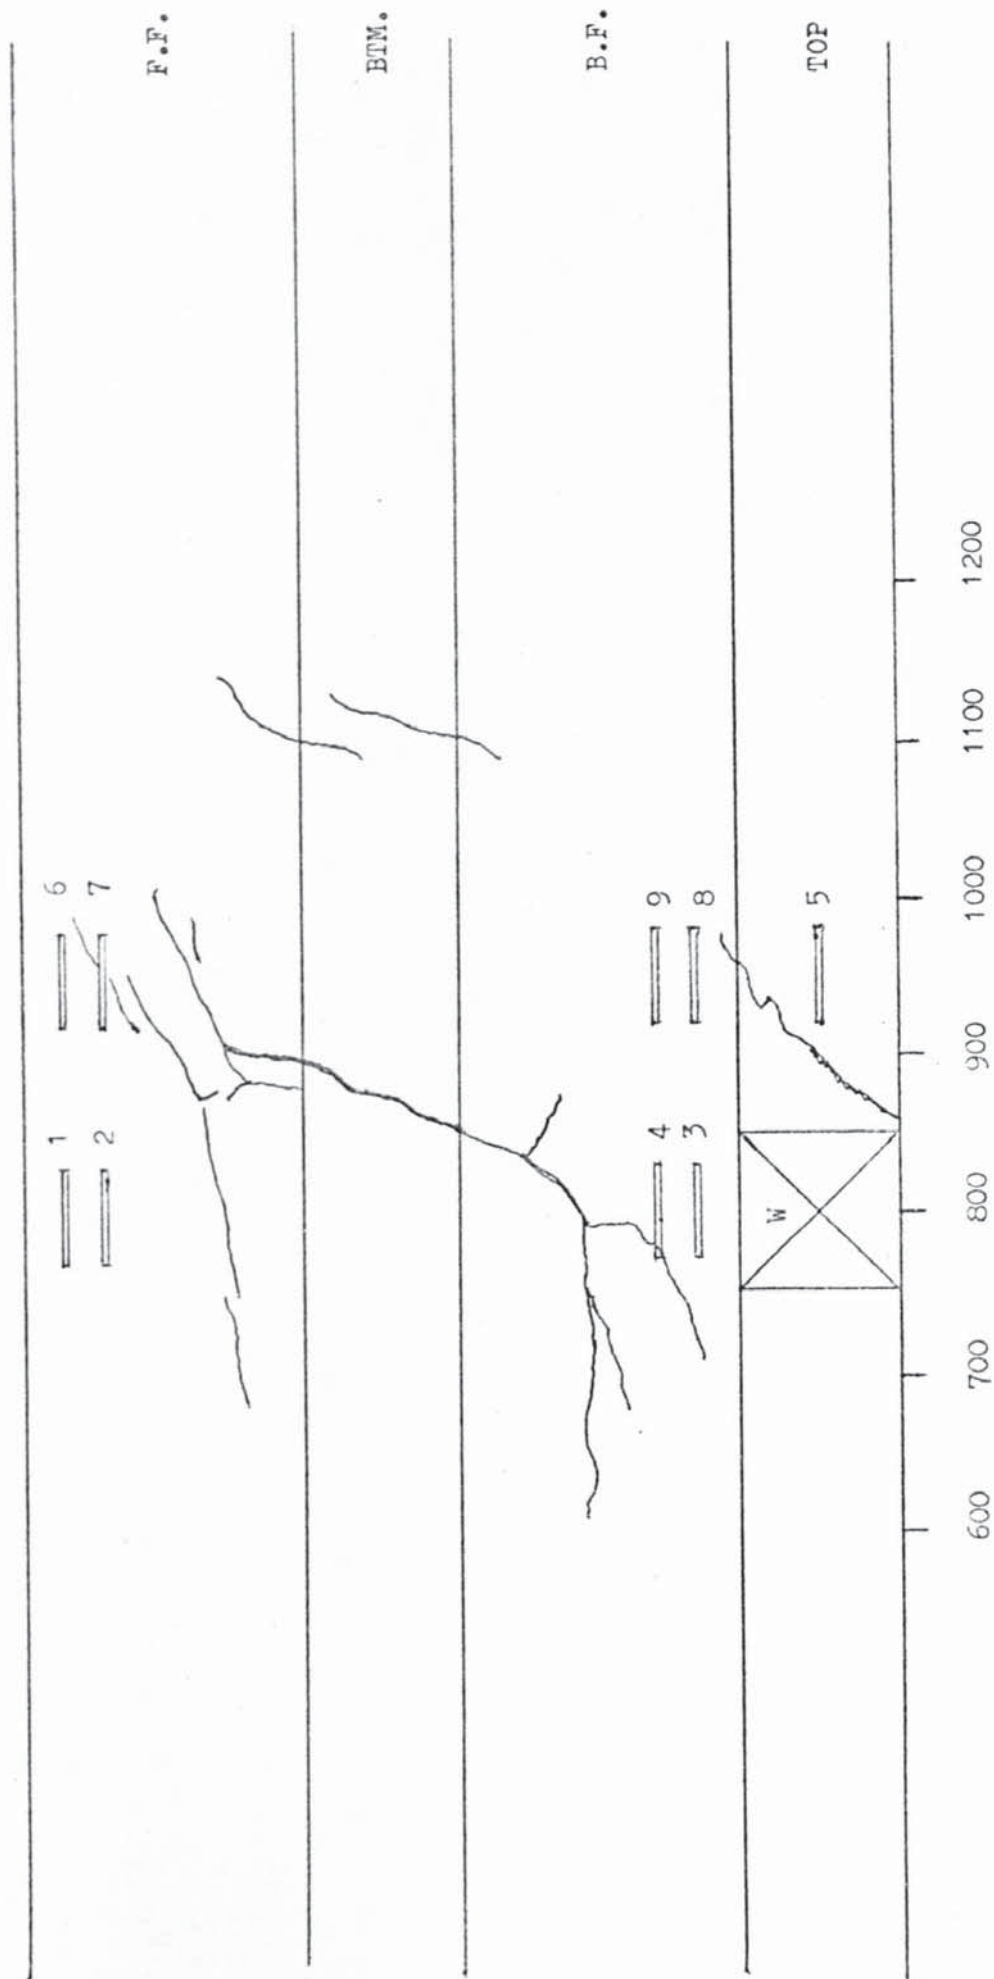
FAILURE CRACK PATTERNS - BEAM 12 (MODE 1/2 )
